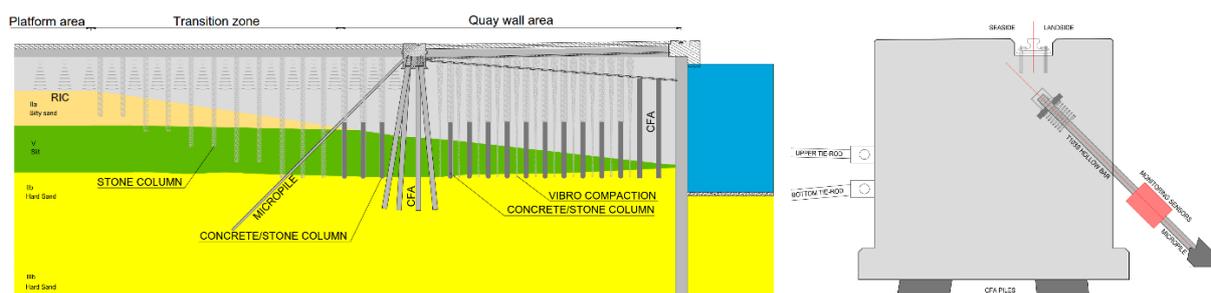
DCT container facility in Gdańsk. Quay cross section (left), hinged connection of the micropiles and land-side crane girder beam (right)
